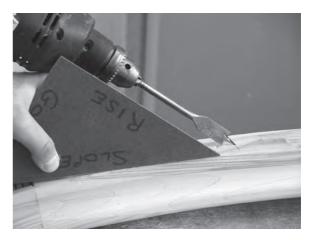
A pitch board can be used as a guide when drilling the inverted handrail on a work bench.
